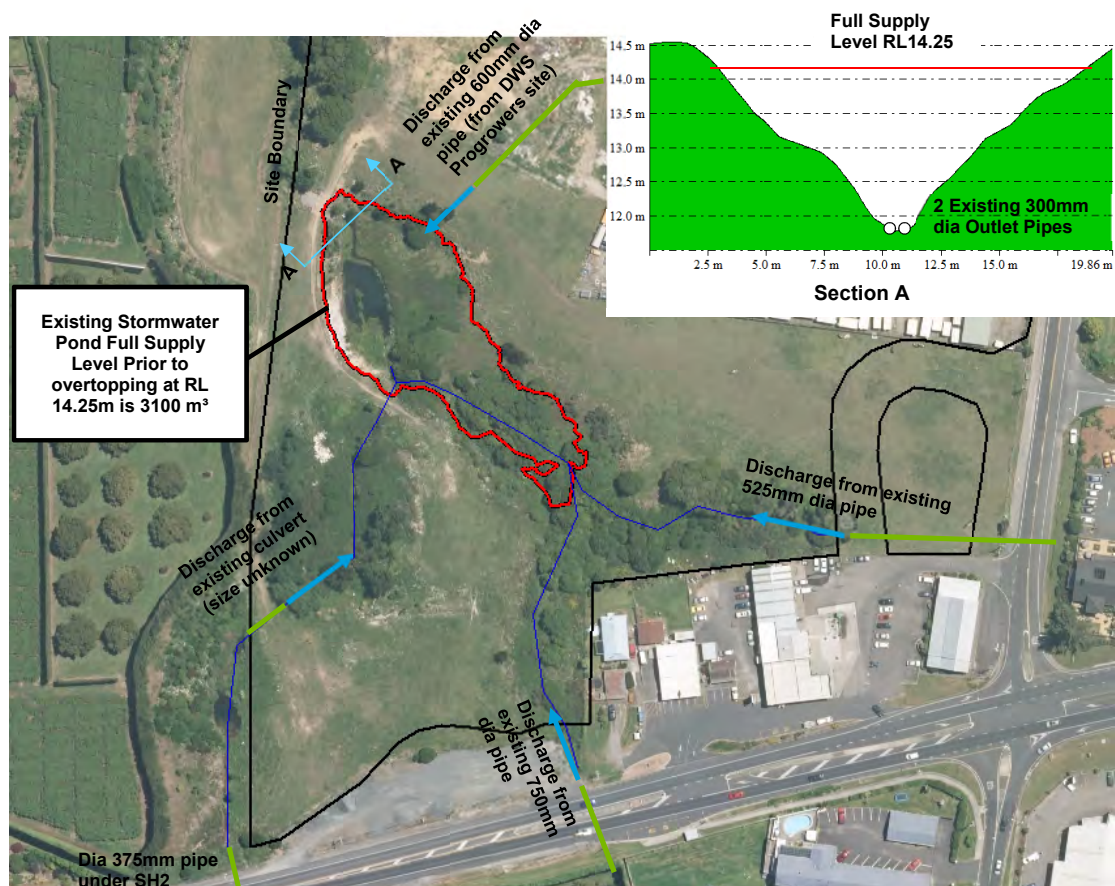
Existing Pond and Tributary Flows (overtopping at RL 14.25m)
